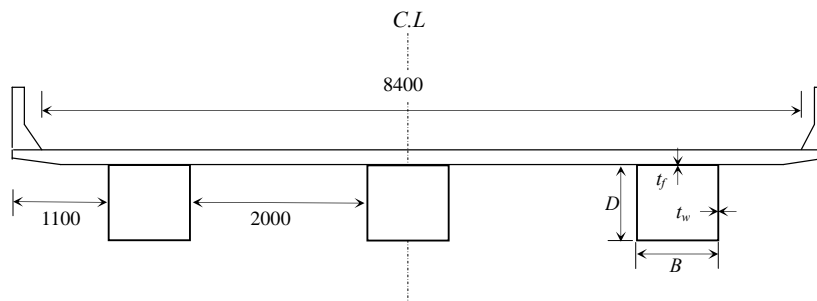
Typical Cross-section of Box-girder Bridge (Dimensions in mm)
